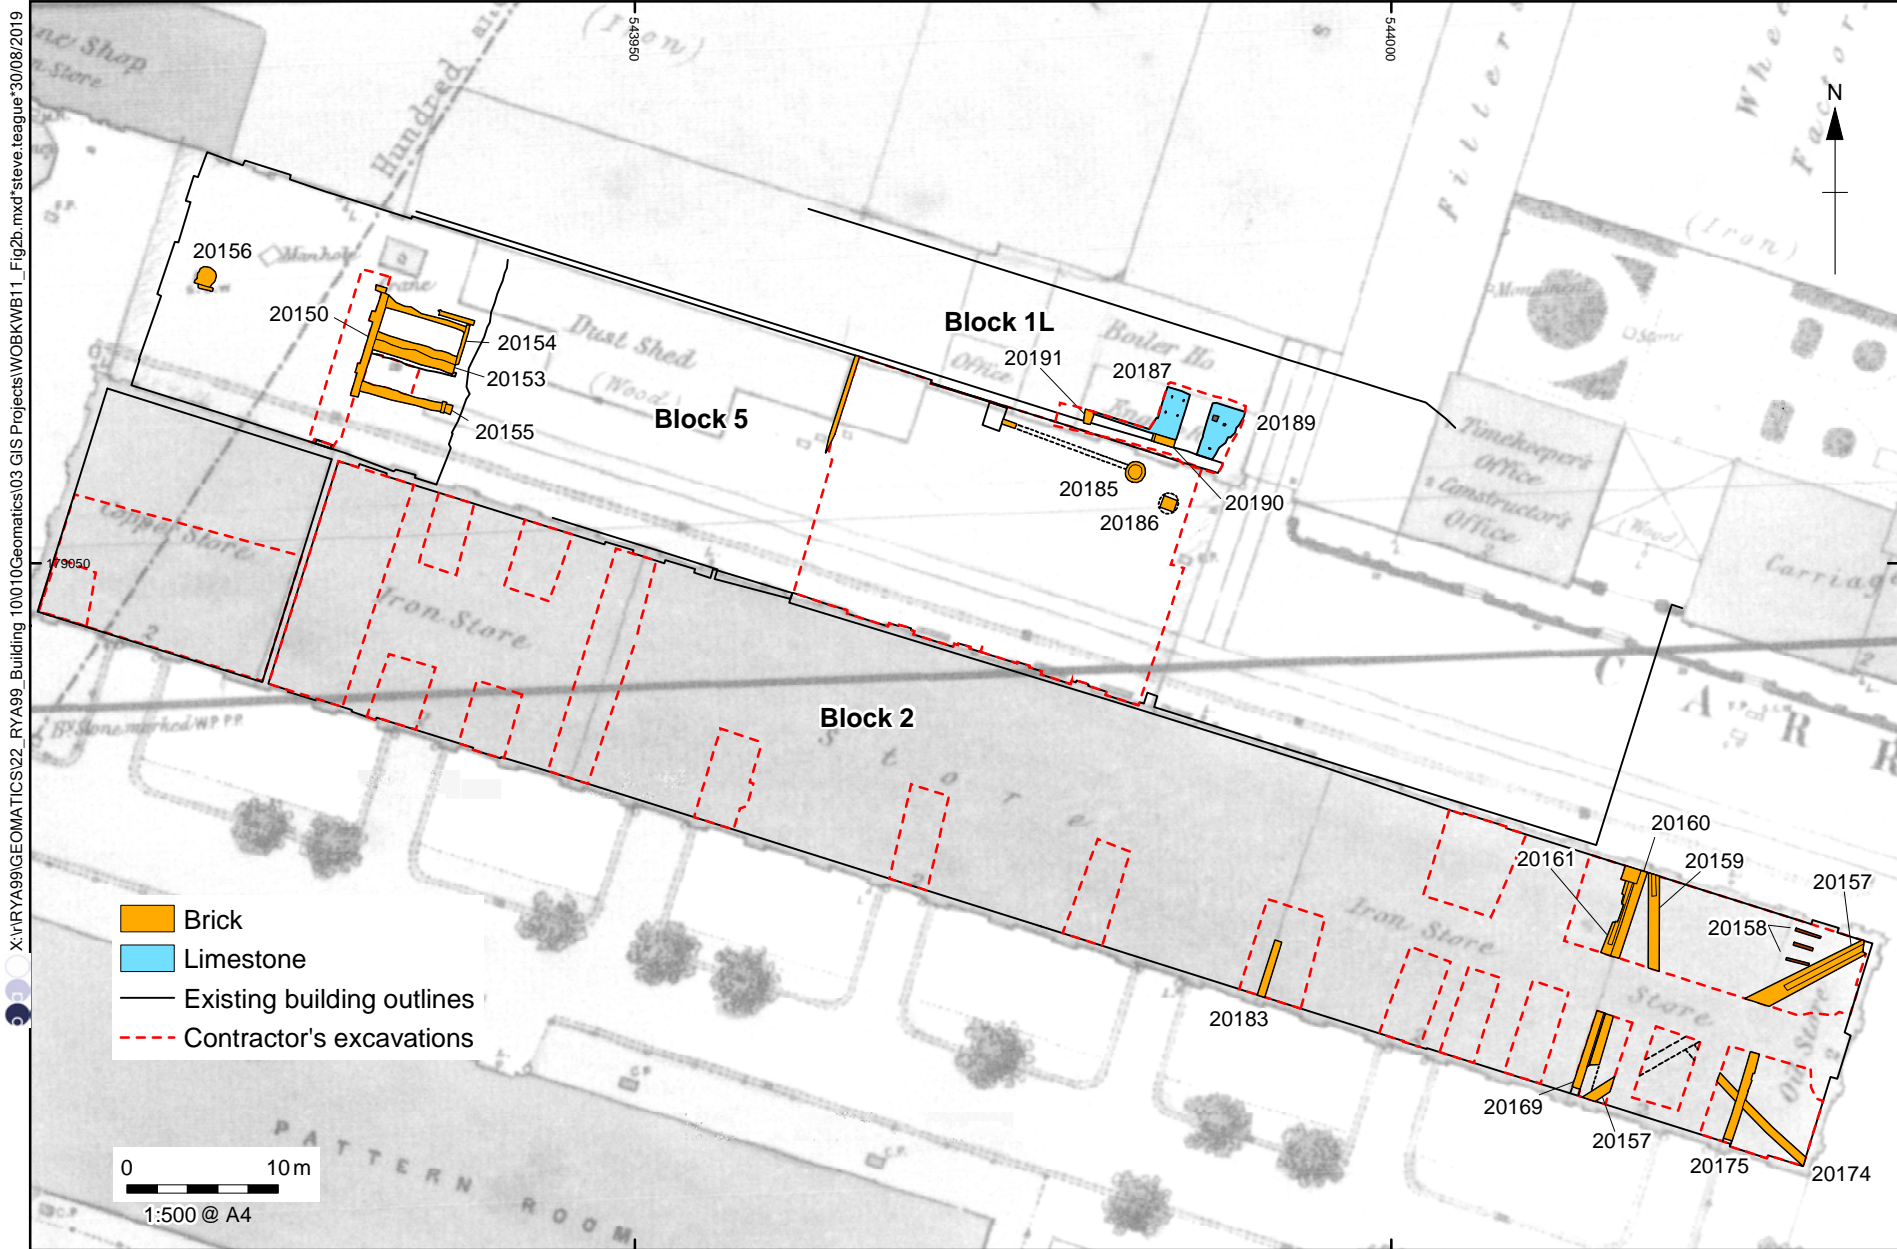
Site plan with Col Sir H Jame's plan of 1866
